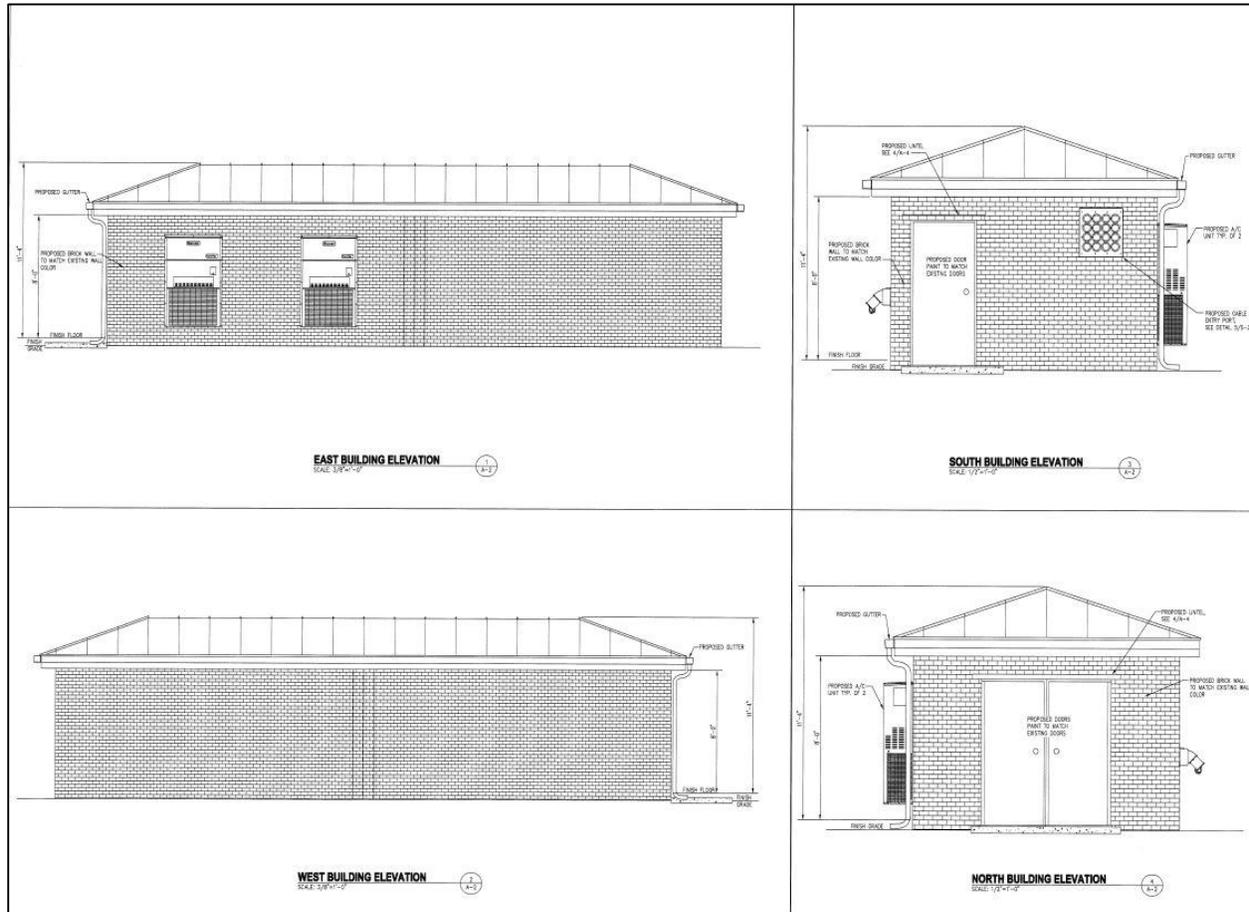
Proposed Equipment and Storage Building Elevation Drawings
